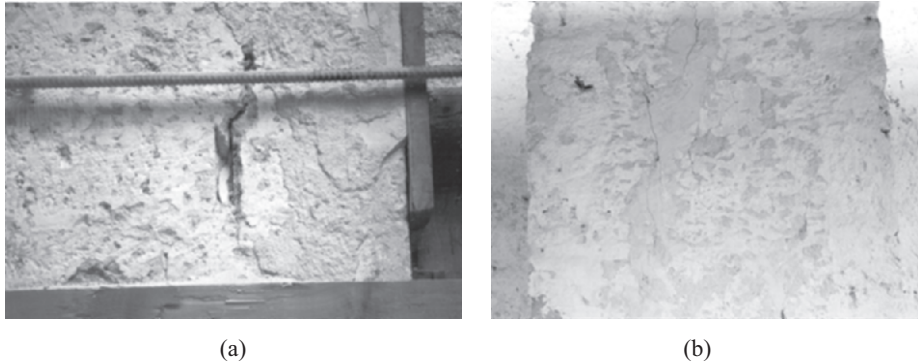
a) Large crack found in a pillar and b) Example of a crack filled with gypsum mortar in the sixties
